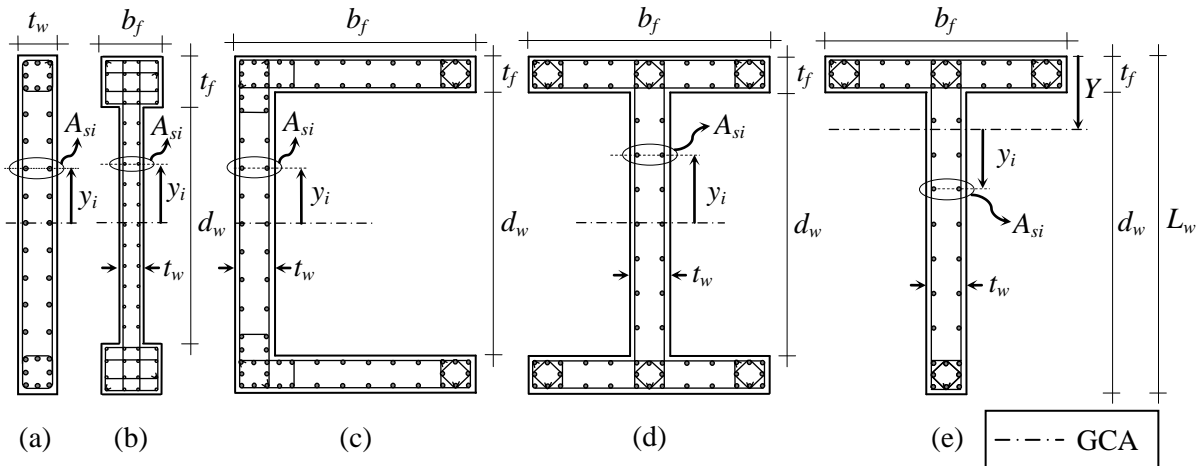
Cross section of (a) Rectangular (b) Dumbbell (c) C-shape (d) I-shape (e) T-shape RC wall
